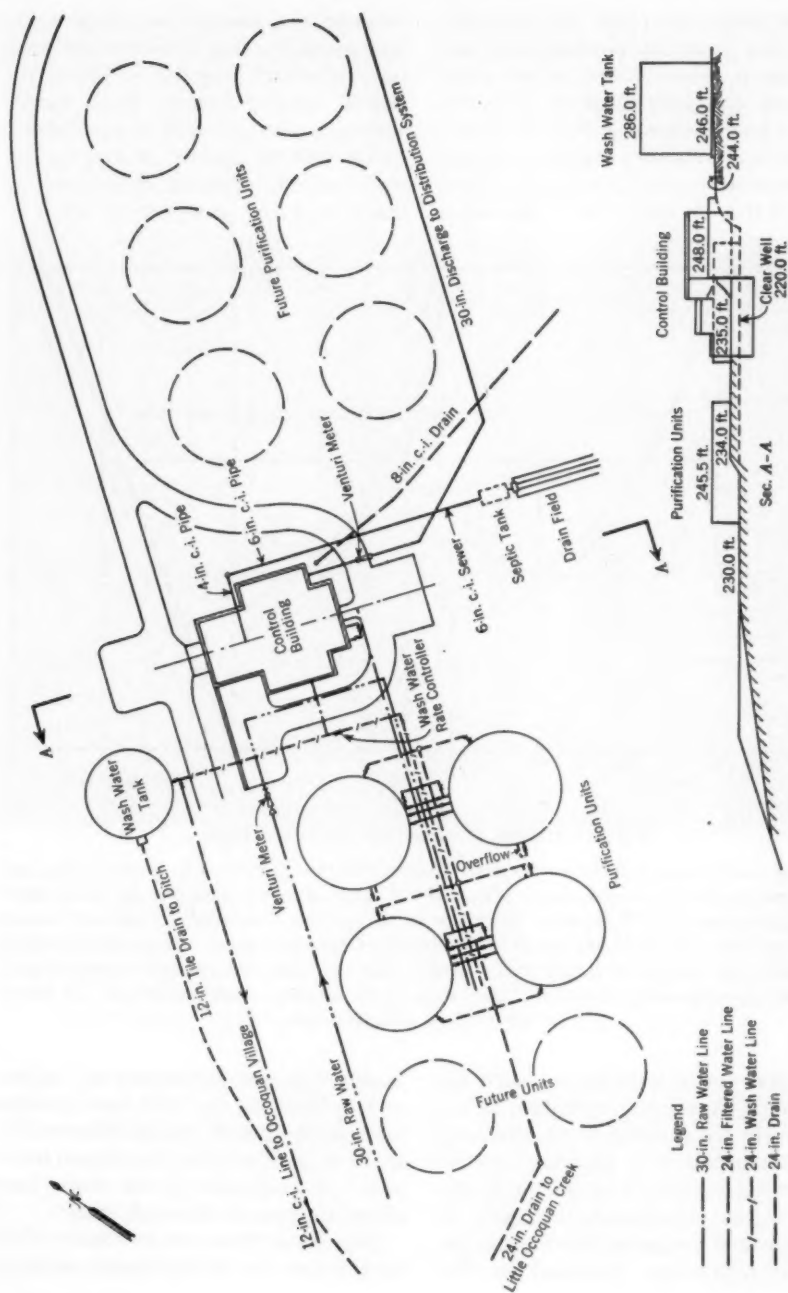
Plan and Elevation of the Purification Plant and High Service Station
